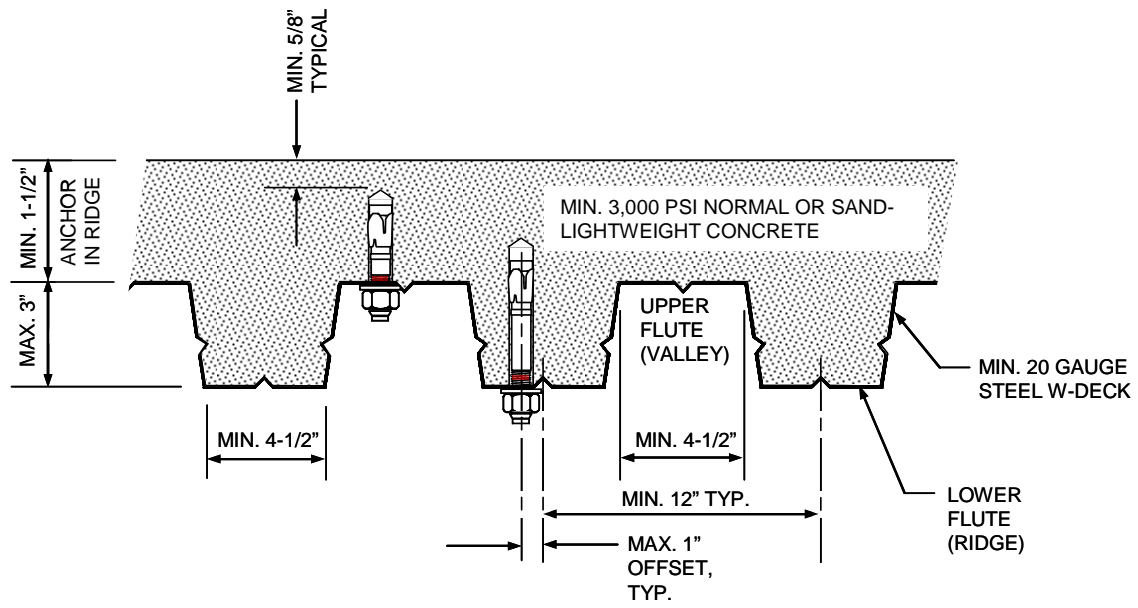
INSTALLATION IN THE SOFFIT OF CONCRETE OVER METAL DECK FLOOR AND ROOF ASSEMBLIES
